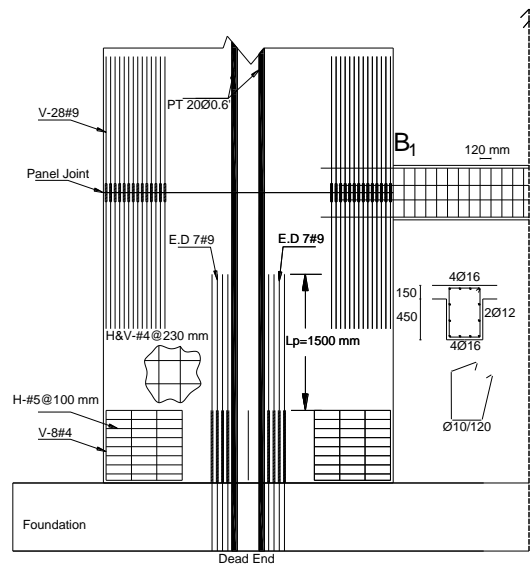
Elevation view of reinforcement scheme of coupled rocking wall system.
